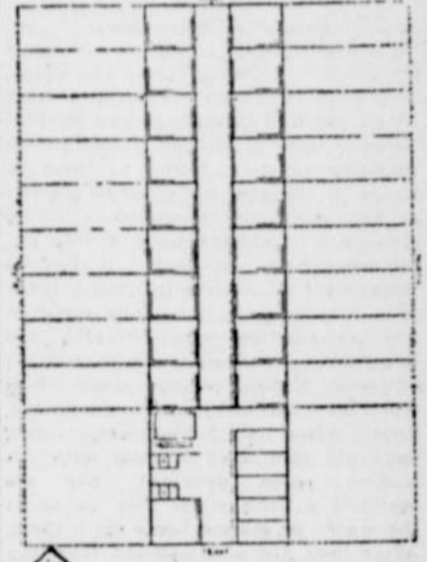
GROUND PLAN OF HOG HOUSE.
